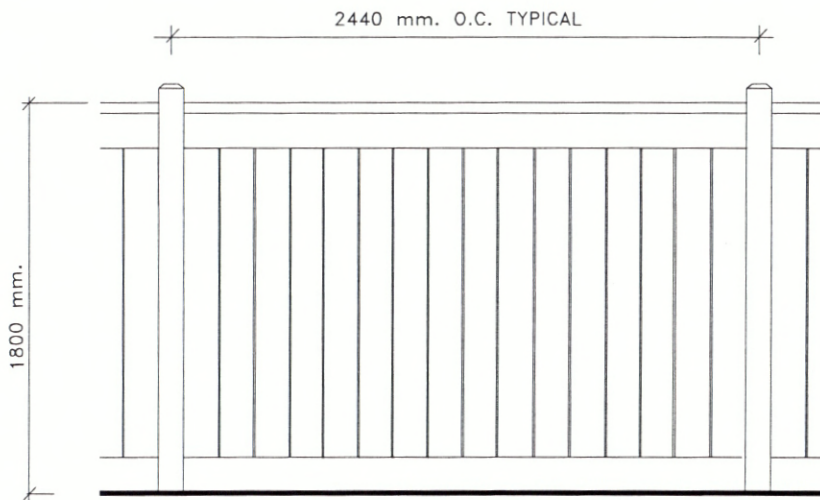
ELEVATION OF TYPICAL PRIVACY FENCE PANEL N.T.S.
